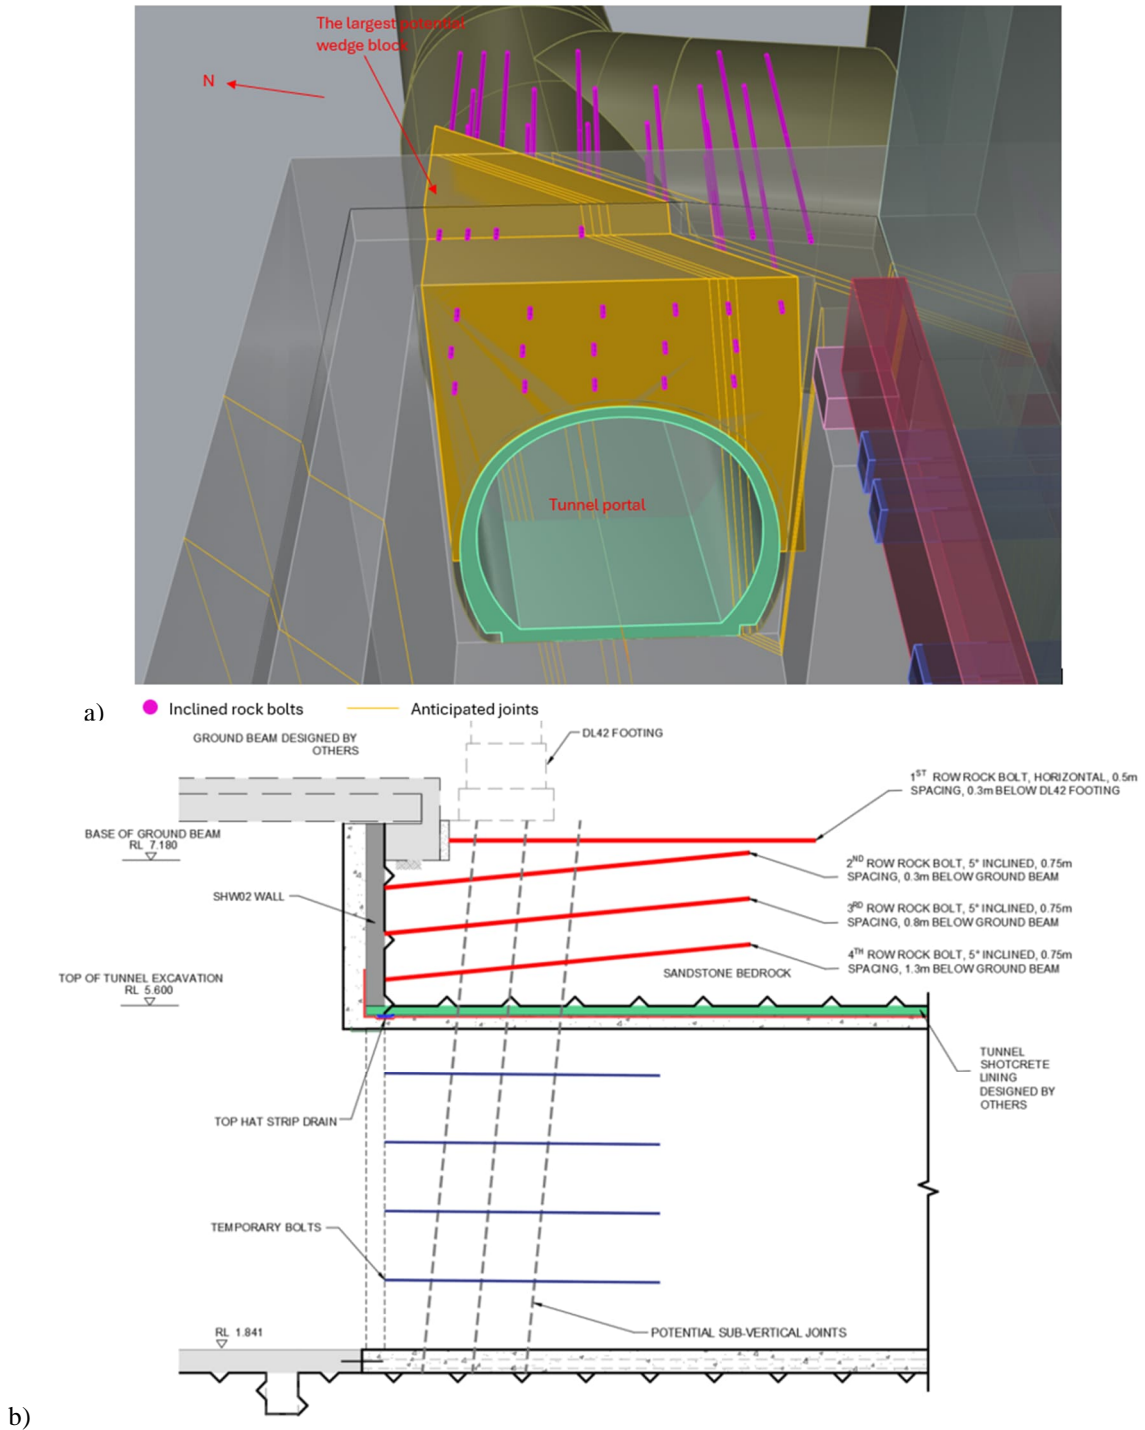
(a) Tunnel portal design model (NB – 3D image of the portal, jointing, and bolts) and (b) bolt layout along the tunnel profile
